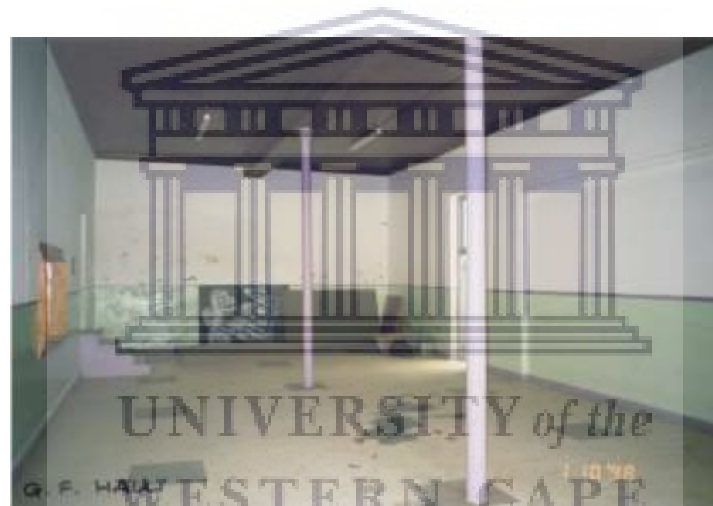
Stepping Stones classroom and entrance were reconfigured as the District Six Museum Memorial Hall. Columns were removed and I beams installed to support the ceiling to provide an open plan design. Photographs Rennie Scurr Architects.
